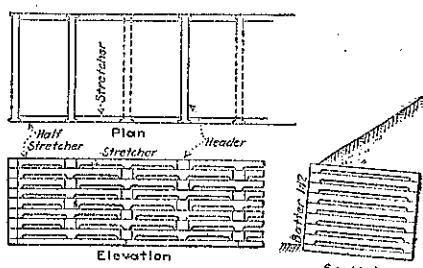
CELLULAR CRIBBING OF CONCRETE UNITS
